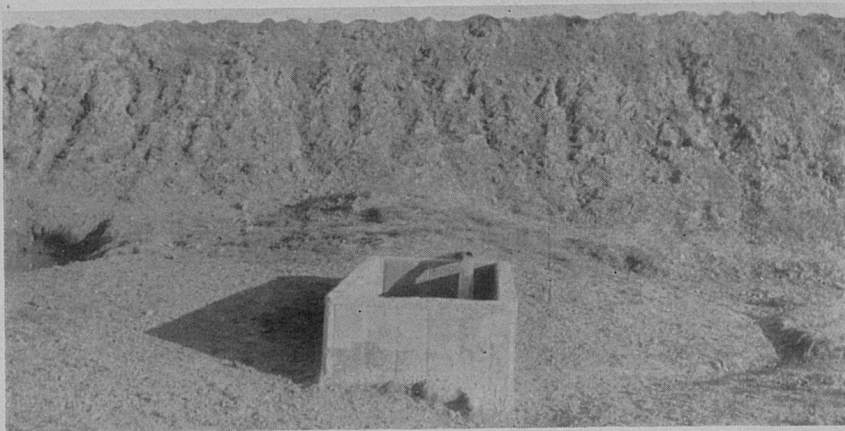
A concrete water trough located below an earth dam and filled by gravity from the reservoir.
